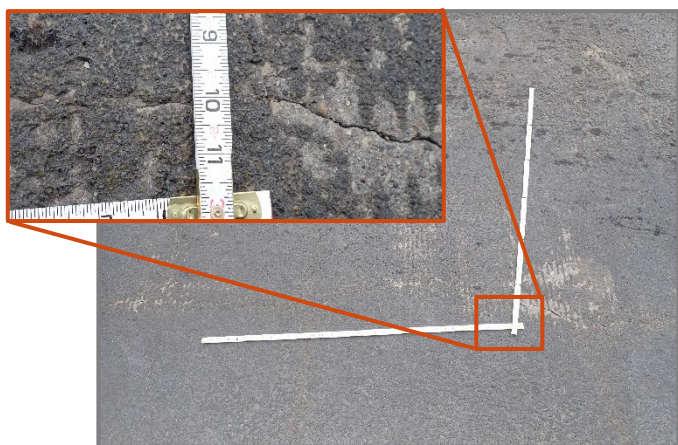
Map cracking up to 1/32" wide spaced at 2' in top surface of the deck in the westbound lane in Span 1, looking south.
